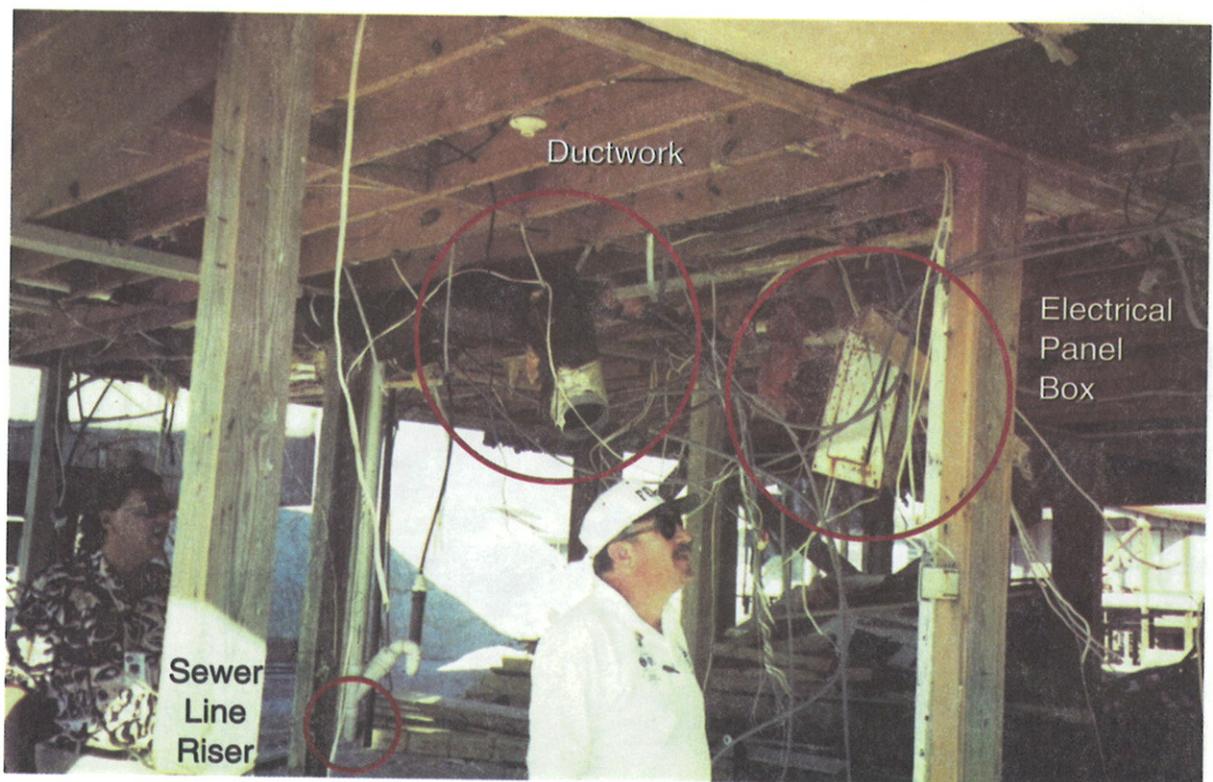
These utility components (wiring, electric panel box, ductwork, and sewer line) were installed adjacent to breakaway wall panel and were damaged when the walls broke away. Note broken sewer line riser pipe on seaward side of piling.
